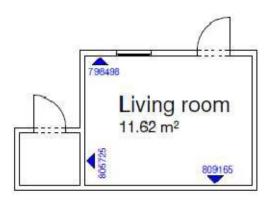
Plan of the ground floor of the temporary KLG Klagergrube showing the data logger locations
